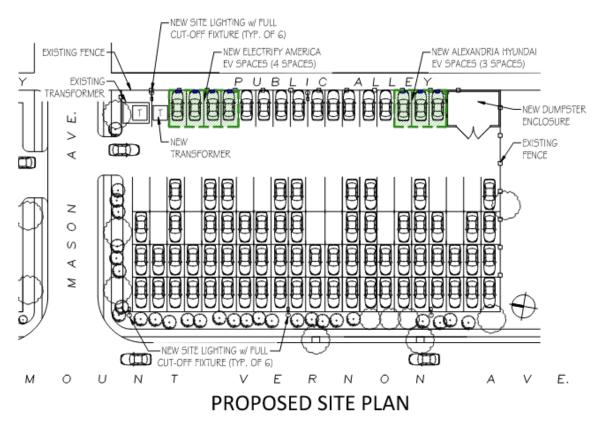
1605-1611 Mount Vernon Avenue proposed site changes
